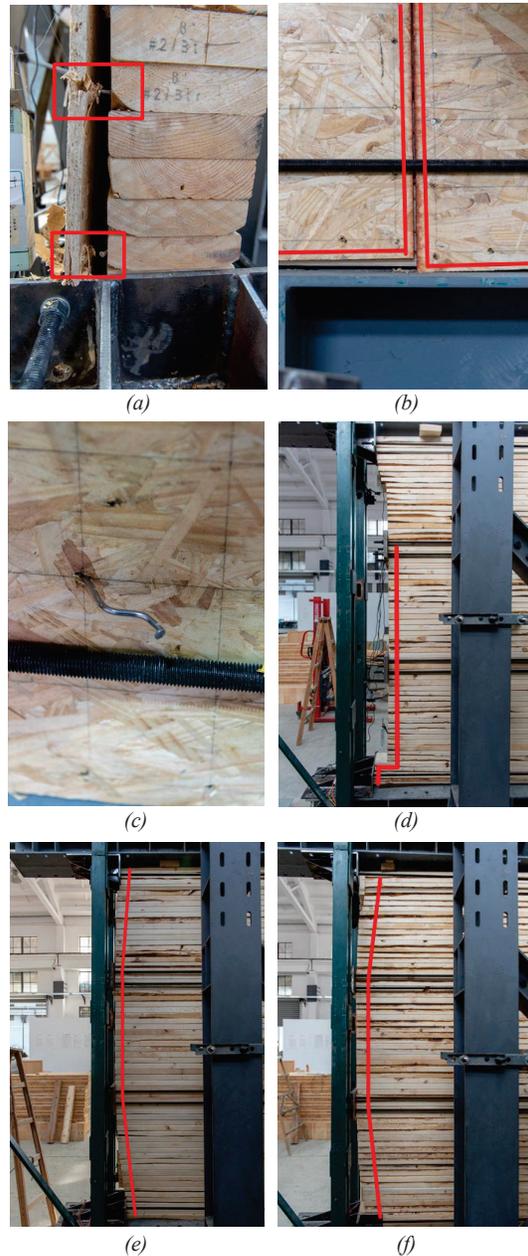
Failure modes of (a) sheathing nail embedment, (b) sheathing dislocation, (c) sheathing nail withdraw, (d) lamina nail failure, (e) floor shear and flexural combined deformation of relatively larger sheathing nail spacing (group A-V), and (f) floor shear deformation of relatively smaller sheathing nail spacing (group B-V).
